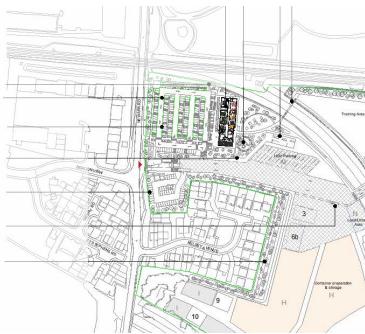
Proposed site plan of the One Murphy Hub development with respect to the surrounding area.
